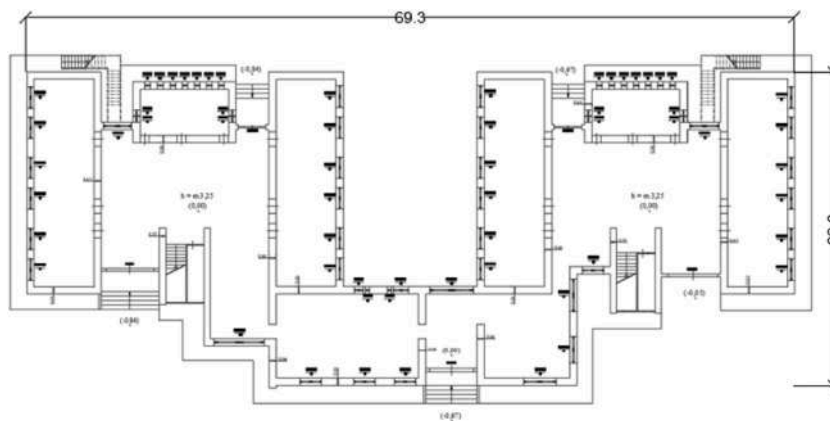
Body A: plan layout of the first level (measurement unit: m).
